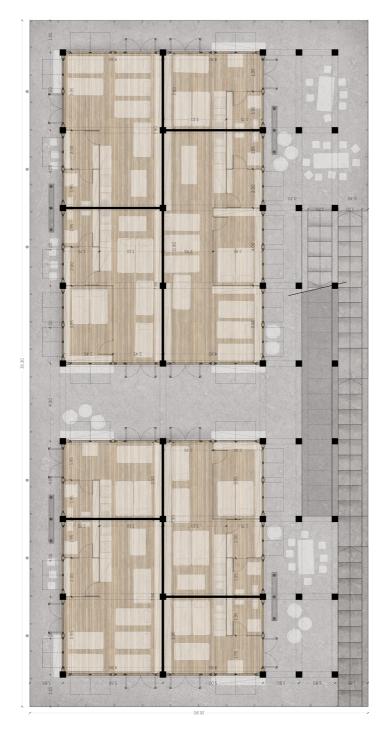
Configuration I: layout of the standard floor-plan during the night. Even in this configuration, each unit has always 2 external walls, to allow natural ventilation.
